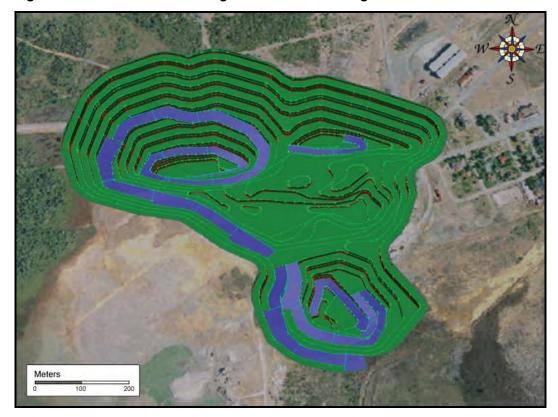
3D Rendered Image of Ultimate Pit Design
